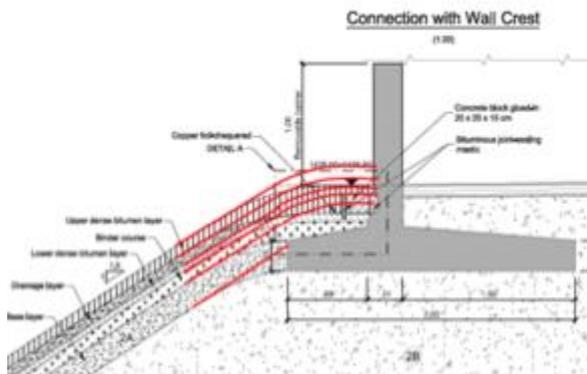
(Step1) Paving: Each layer of asphalt face is paved with a shape that rounds the crest shoulders.
